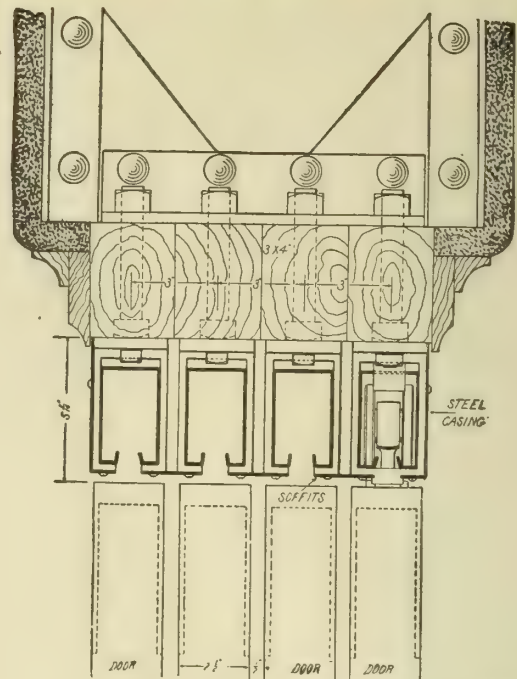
NO. 443 CROSS-SECTION, FLUSH DOOR HANGER
